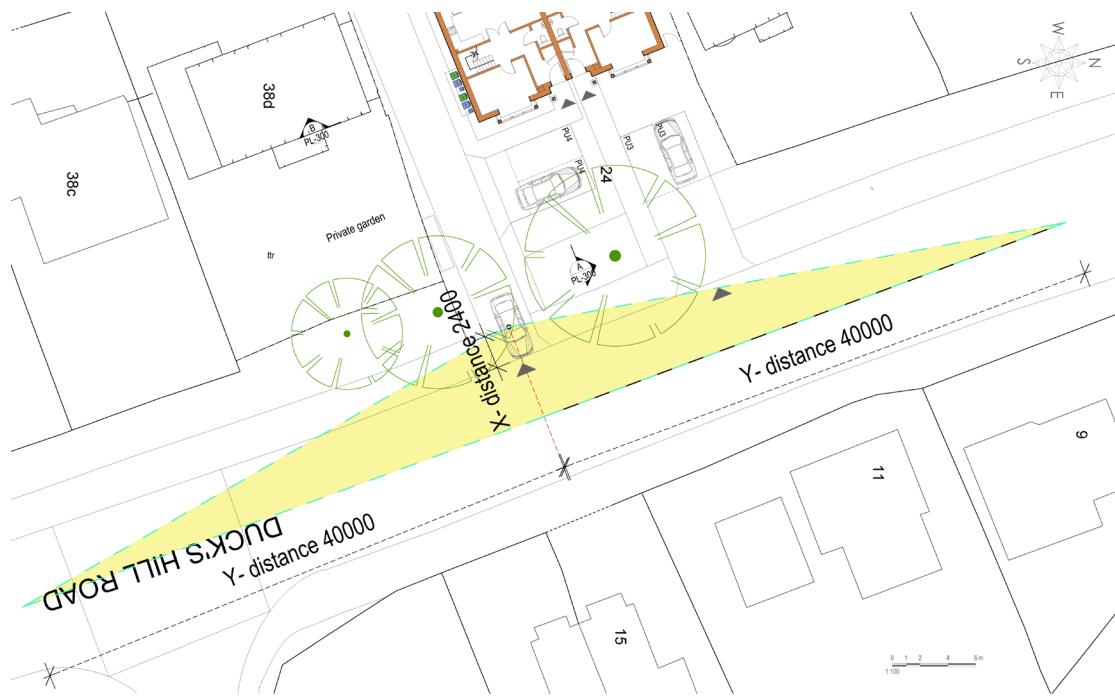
Proposed Site Plan Traffic Splay Diagram.
